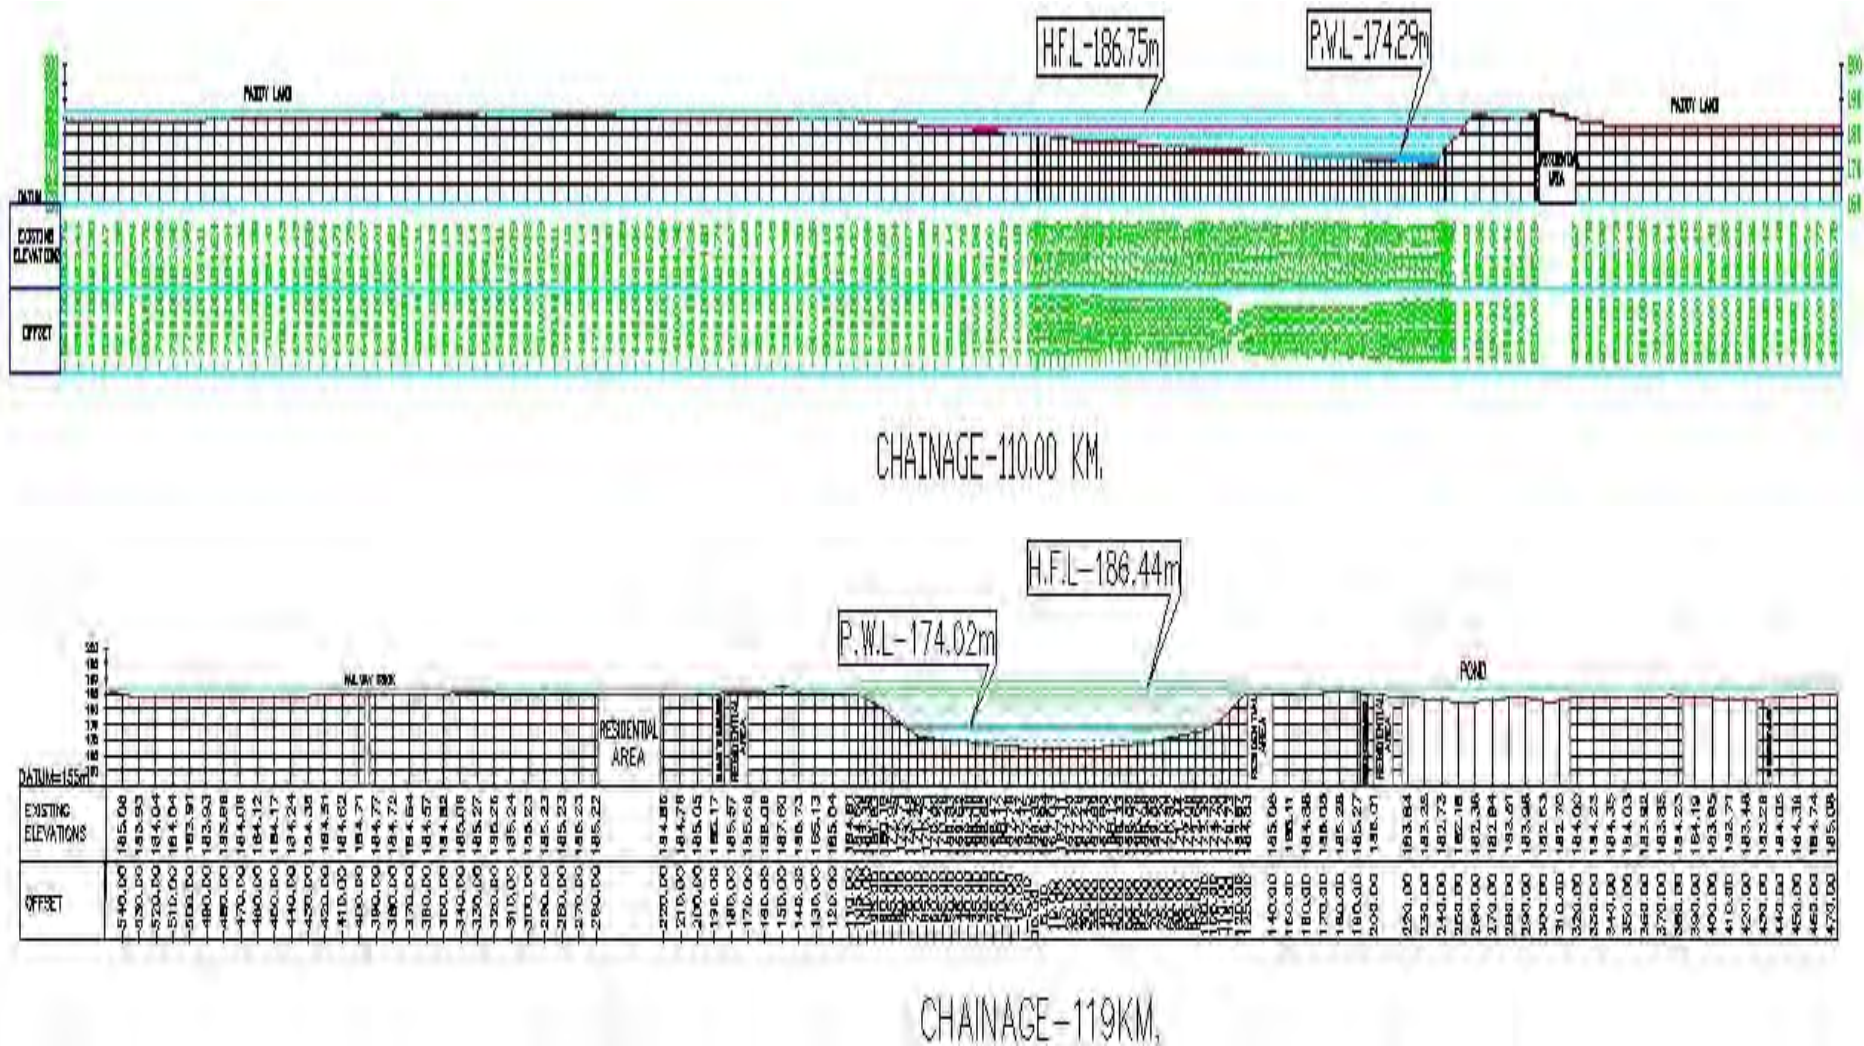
(f) Section Details of Barak River upto 500m in the countryside
